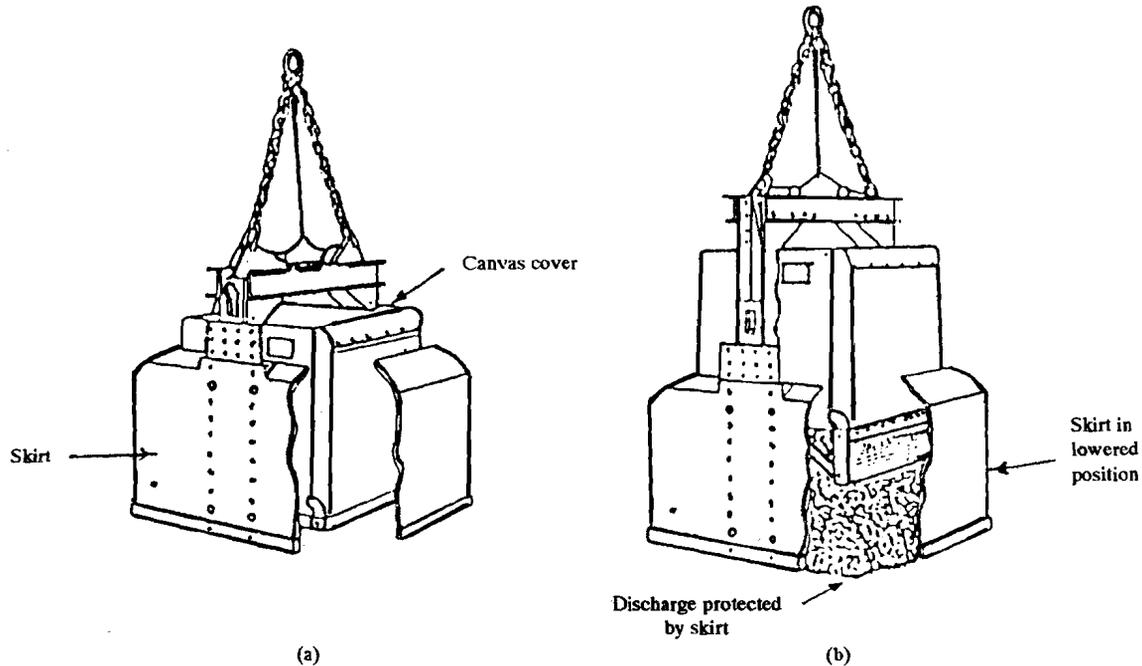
Placement with the Bottom Dump Bucket : (a) Filled; (b) Discharging.
